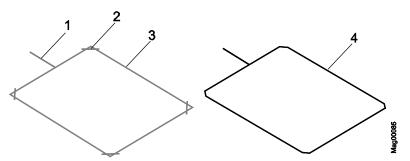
Installing induction loop in bitumen, asphalt, or concrete
